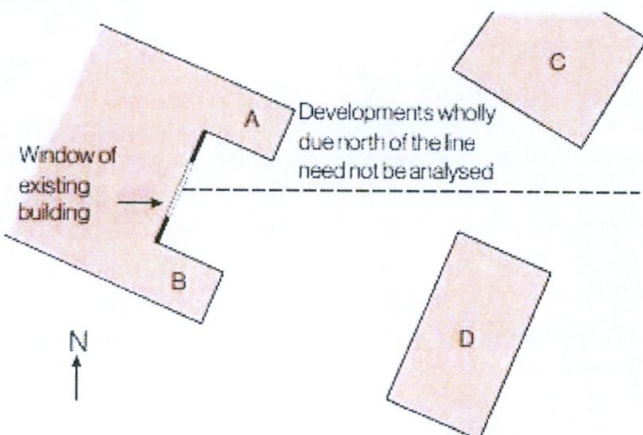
In analysing the sunlighting impact on the existing window, no check need be made for proposed extension A and new building C, as they lie within 90° of due north of the window. Proposed extension B should be checked, as should new building D if it subtends more than 25° to the horizontal, measured in section from the centre of the window
